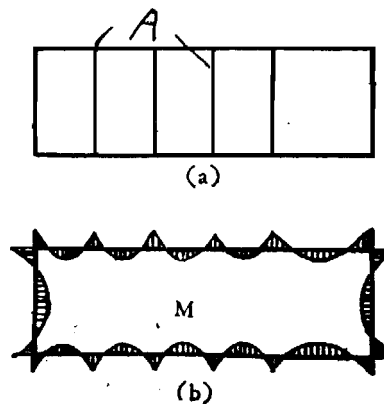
Bending Moment Diagram of Foundation with Partition Walls due to External Normal Frost Heave Stress
